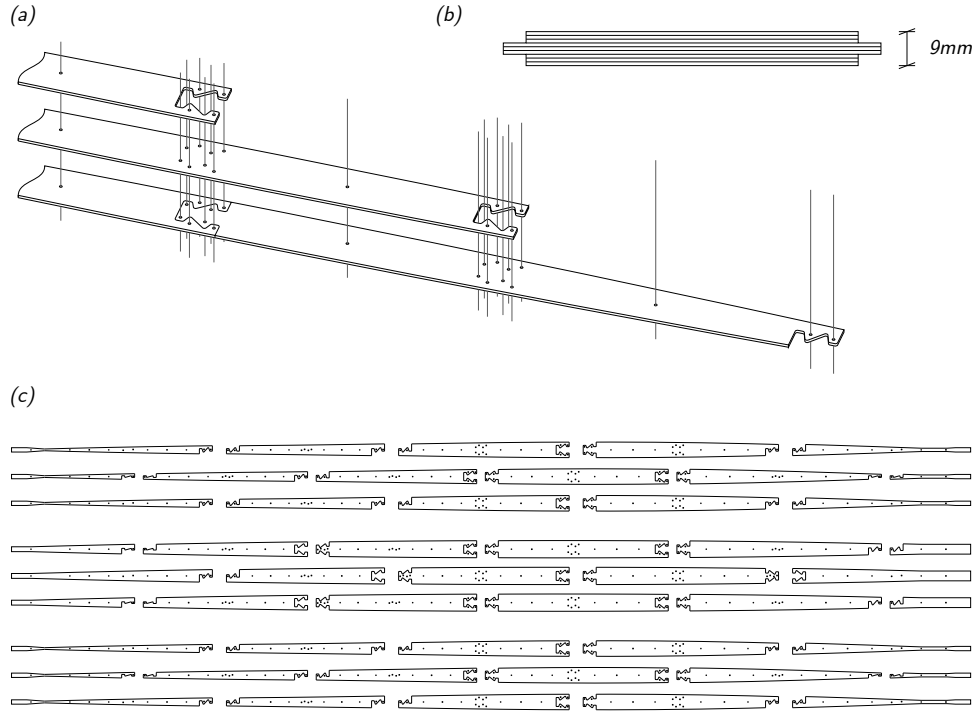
Laminated beams – (a) Assembly logic of a laminated beam from segmented lamellas, (b) laminated beam cross section from 9 lamellas and (c) pattern of the constituting lamellas of one of the two beams.
